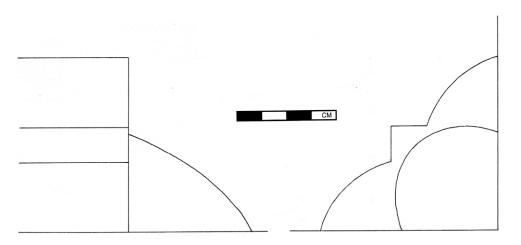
The chamfer stop on the eastern section of lower joist 2 from the floor of room 134.
